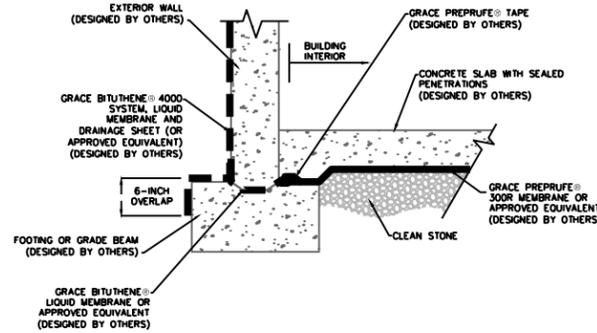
TYPICAL VAPOR BARRIER ASSEMBLY AT INSIDE CORNER
